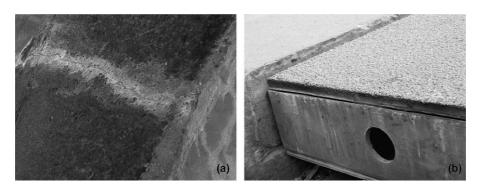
Cracking at FRP deck connection regions. (a) At panel connection. (b) At component connection.
